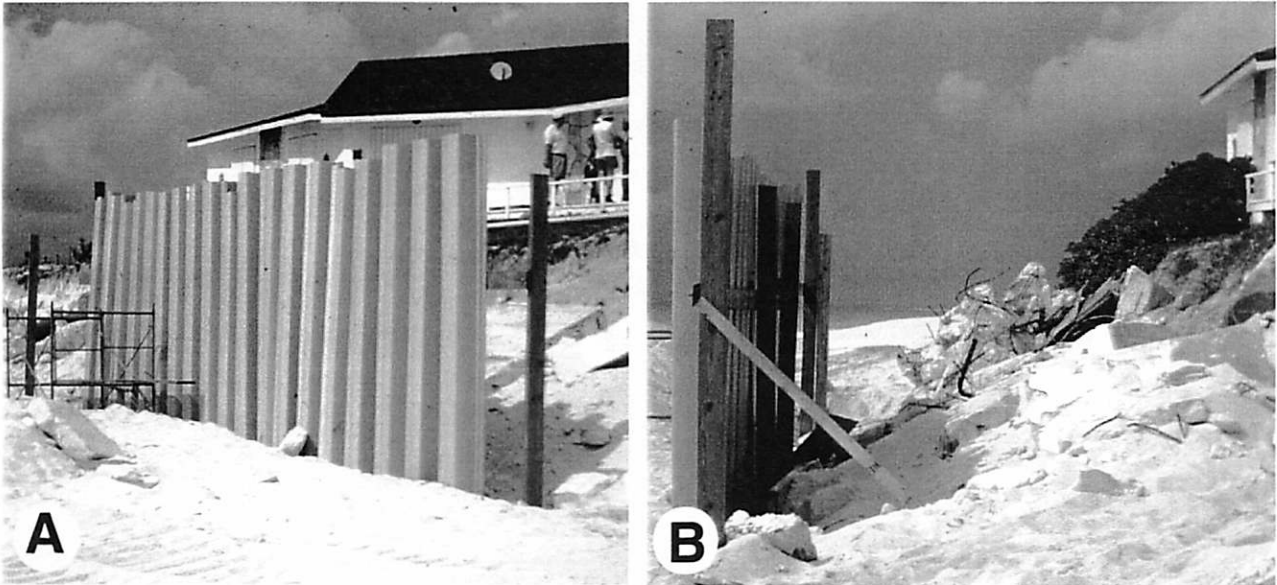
Following Hurricane Floyd, Mr. Savio had to take action to protect the foundation of his house. In June 2000 a seawall was under construction. A) Front view of the seawall, made of interlocking PVC sections. B) View of the seawall construction from the south.
